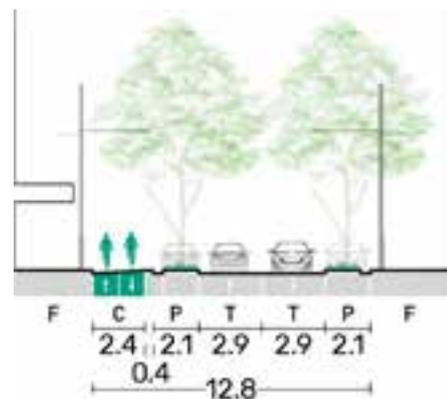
Typical cross section - constrained configuration (12.8m carriageway)
